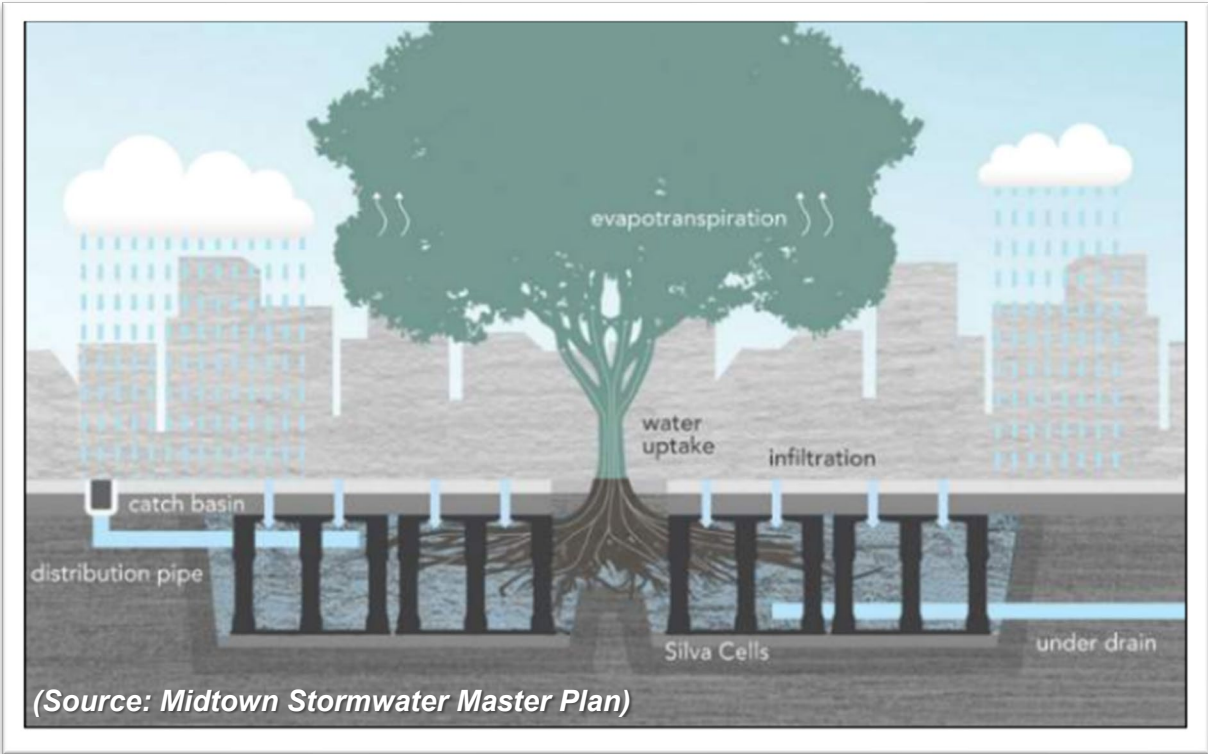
Narrow Streetscape Planters Using Suspended Pavement Can Facilitate Successful Inclusion of Trees
